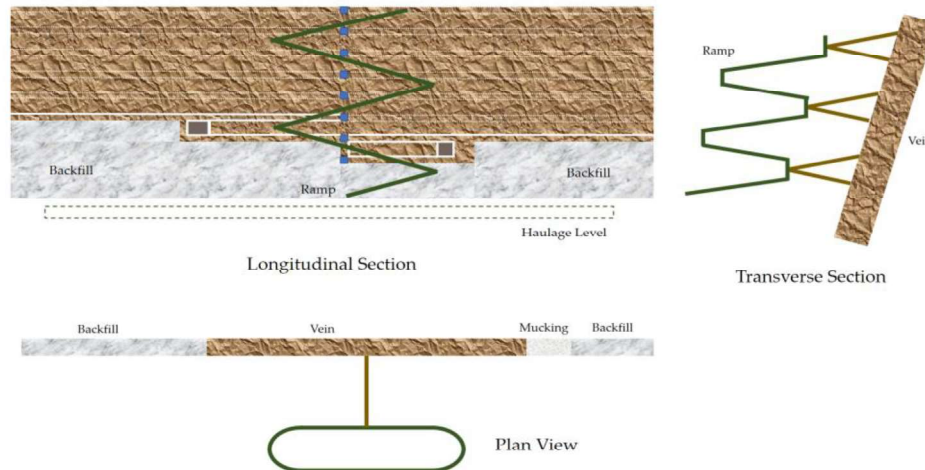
Bench & Fill – Mining method (Schematic Section and Plan Views).
